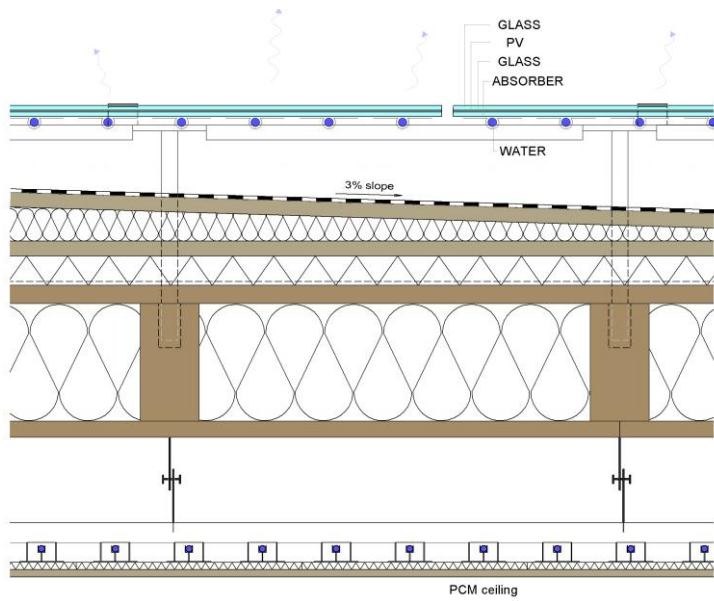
Roof construction of Solar Decathlon Building with PVT collector.
